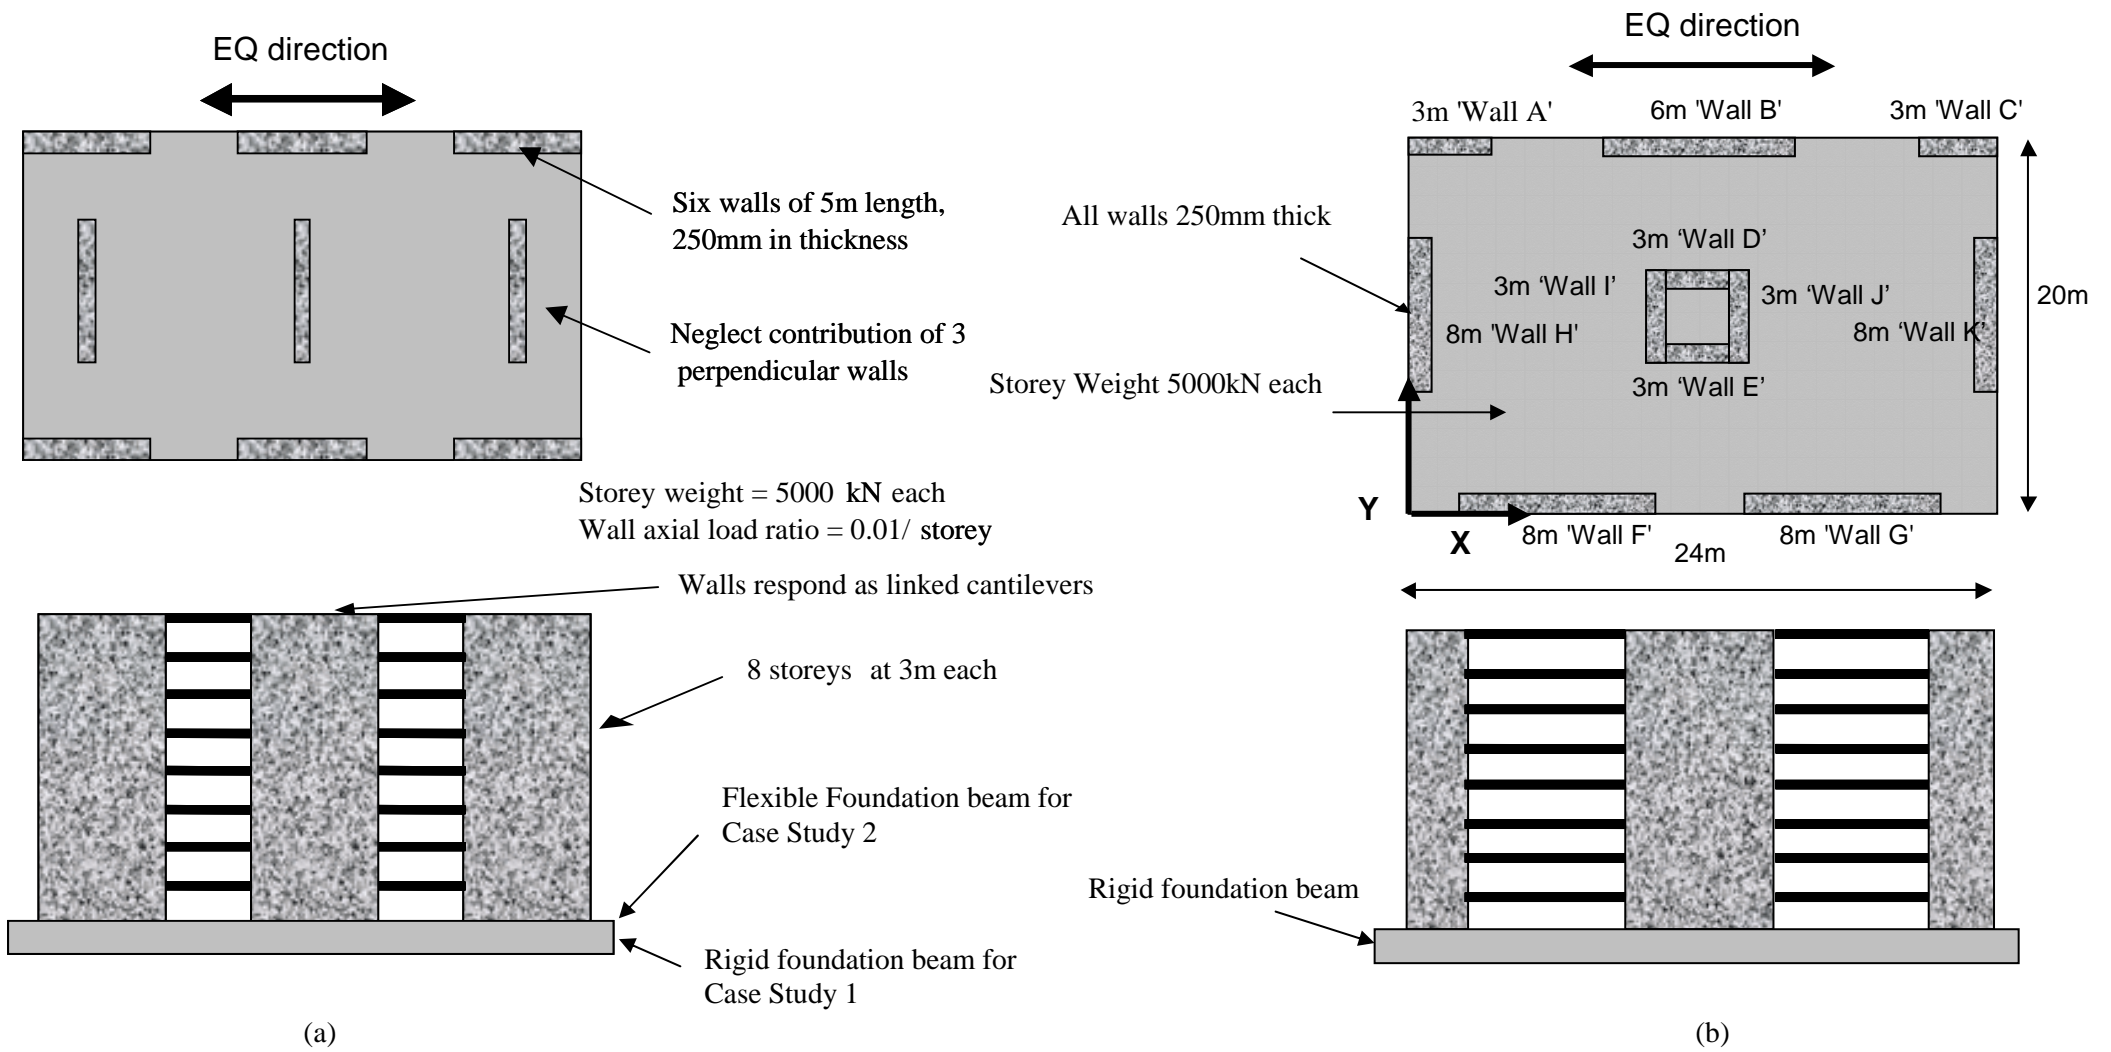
Details in plan (top) and elevation (bottom) of (a) Case Studies 1 and 2, Wall Structures With and Without Flexible Foundation beam, and (b) Case Study 3 – Wall Structure with Irregular Layout
